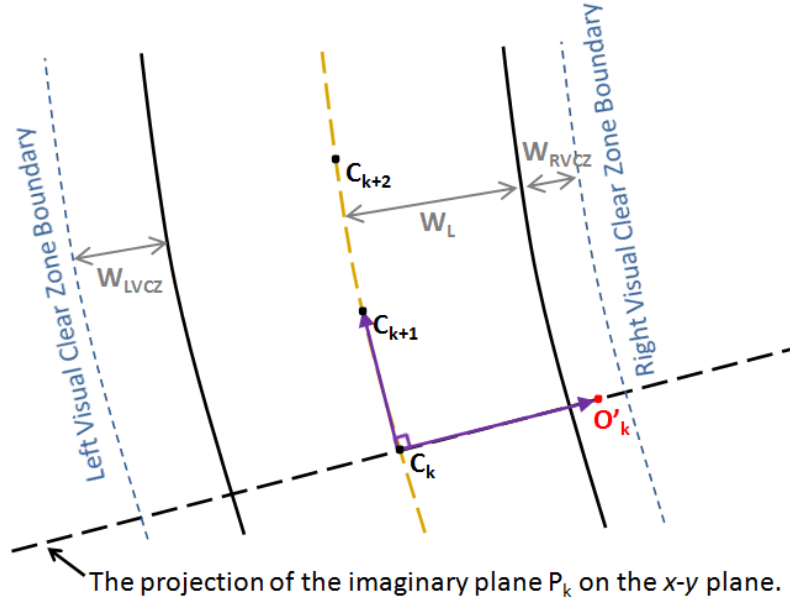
Plan view of the road segment at C_k (when $W_{LVCZ} > W_{RVCZ}$)
